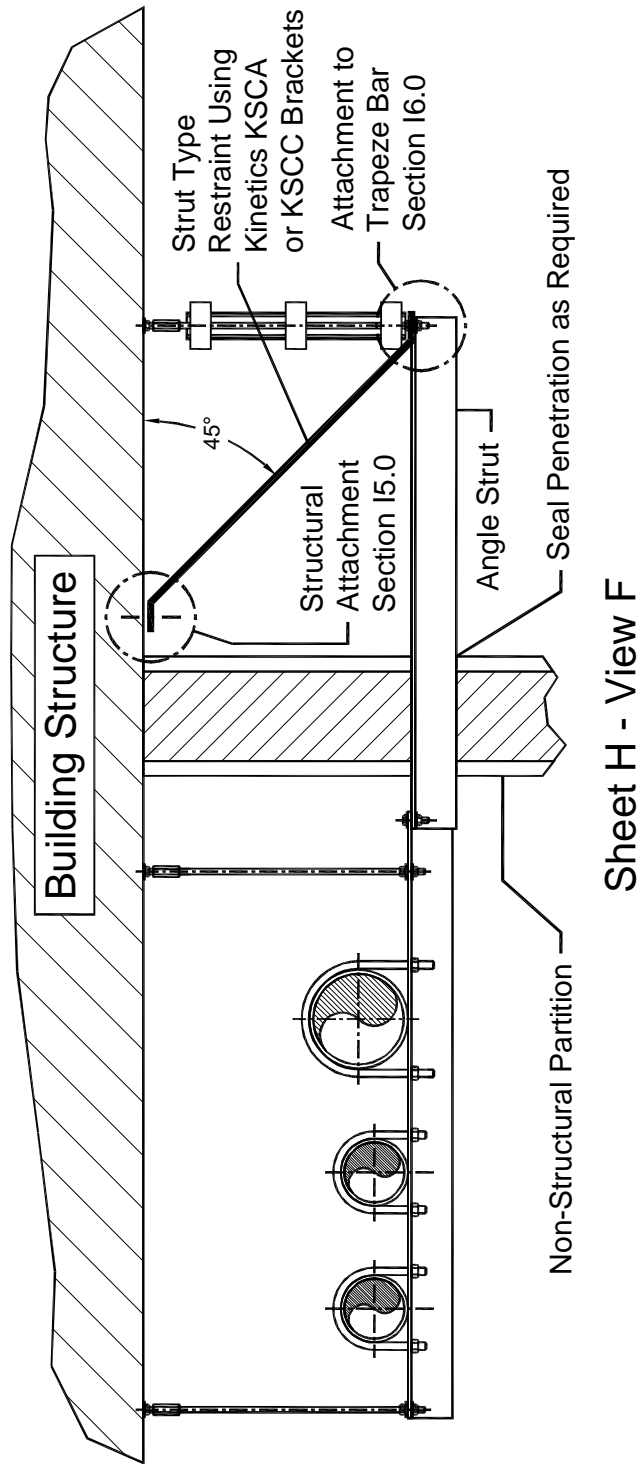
; Transverse (T) Strut Type Restraint Schematic for Trapeze Supported Pipe – Trapeze Bar is Too Close to a Wall to Allow a Normal Restraint Arrangement – Obtain Permission from the Structural Engineer and Architect Before Penetrating the Wall
